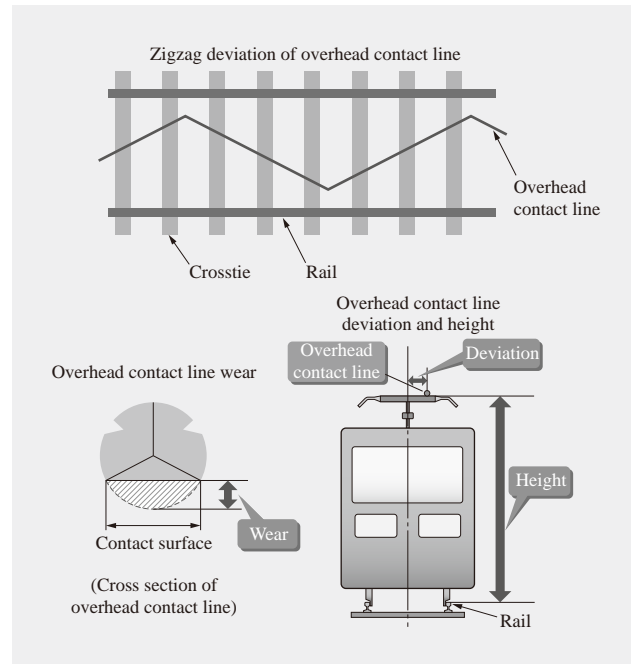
Measurements Performed for Overhead Contact Line Inspection.
